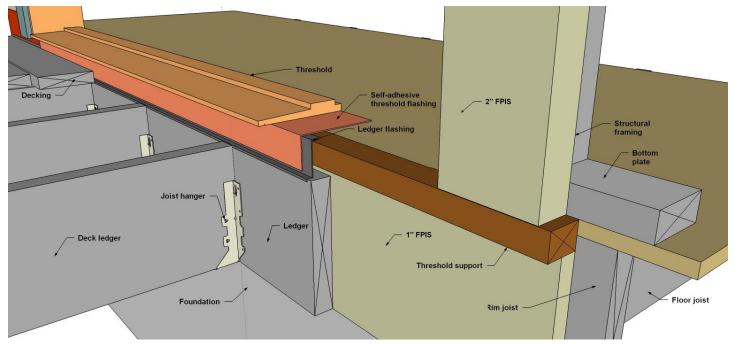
Deck Ledger – 2" FPIS Wall Sheathing, 1" FPIS Behind Ledger at Patio Door Opening
